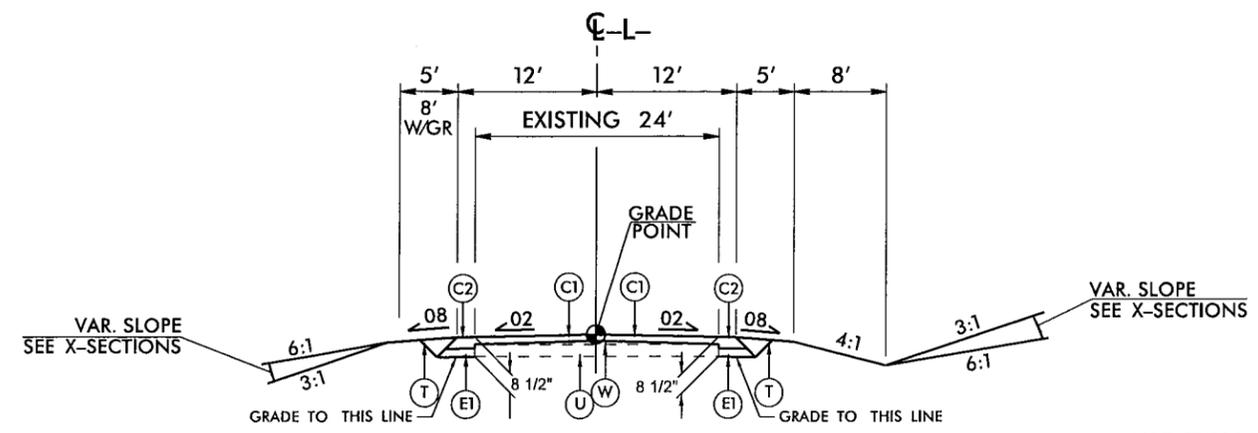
DETAIL SHOWING SHOULDER BERM GUTTER ON TOP OF SUBGRADE
